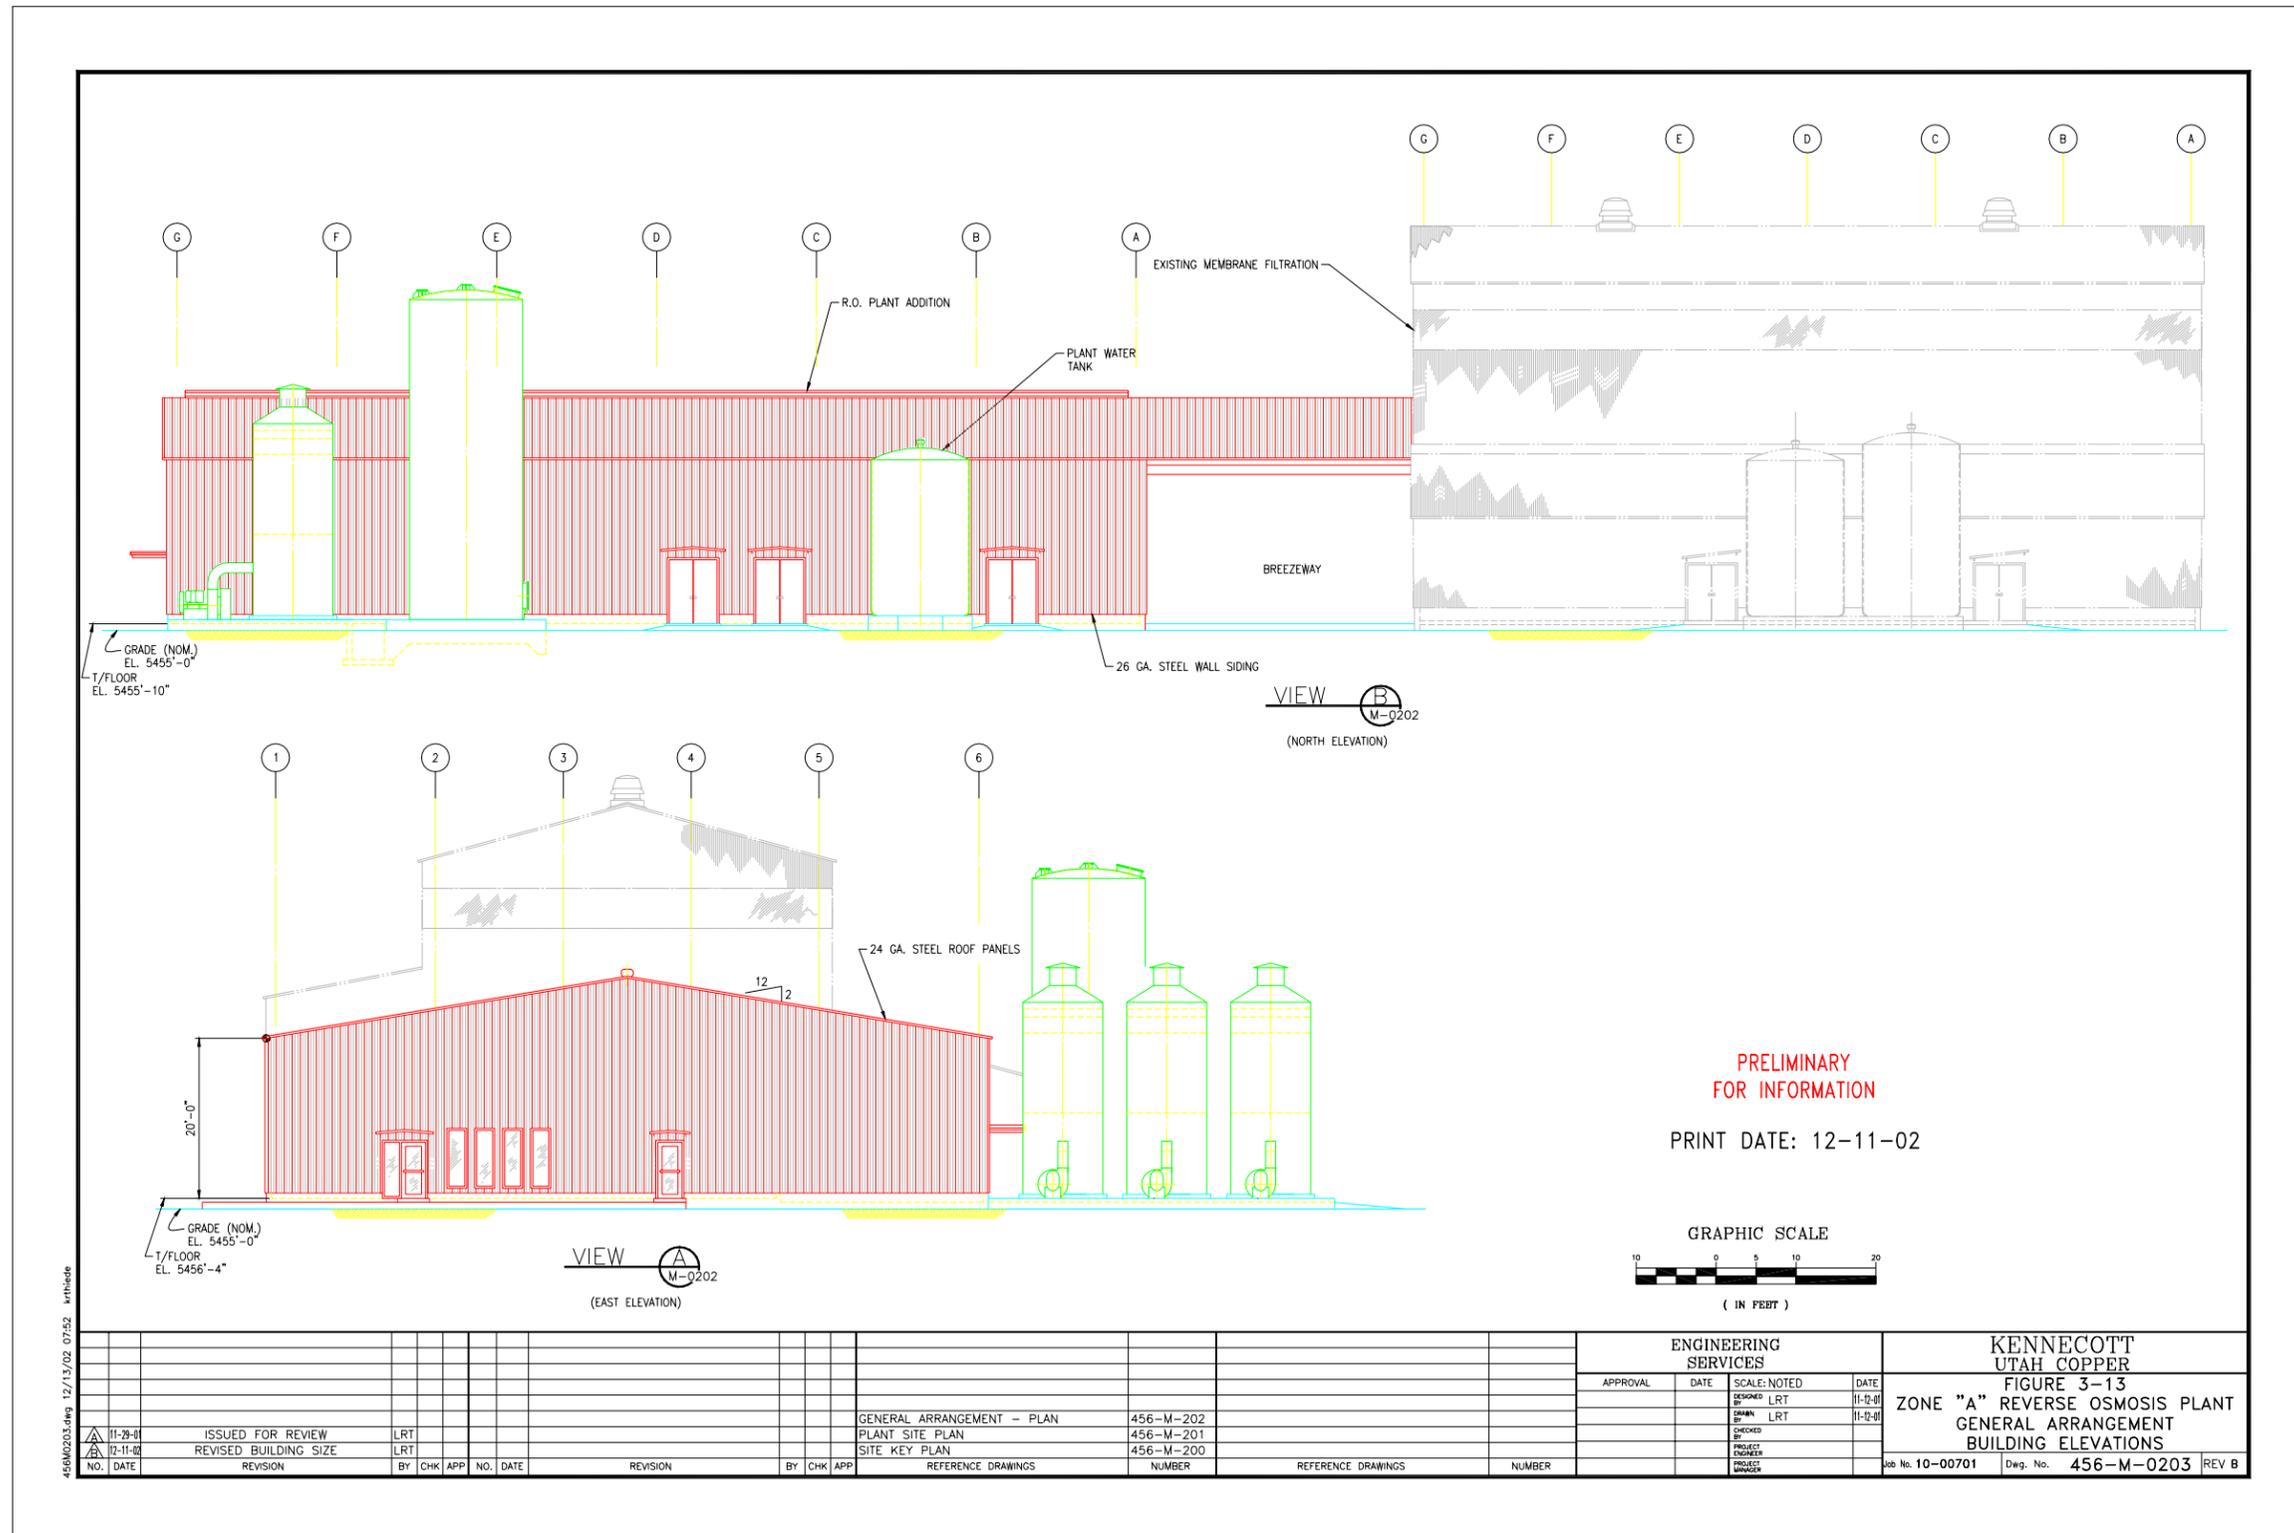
Zone A RO Plant Building Elevations, Dwg. No. 451-M-0203
